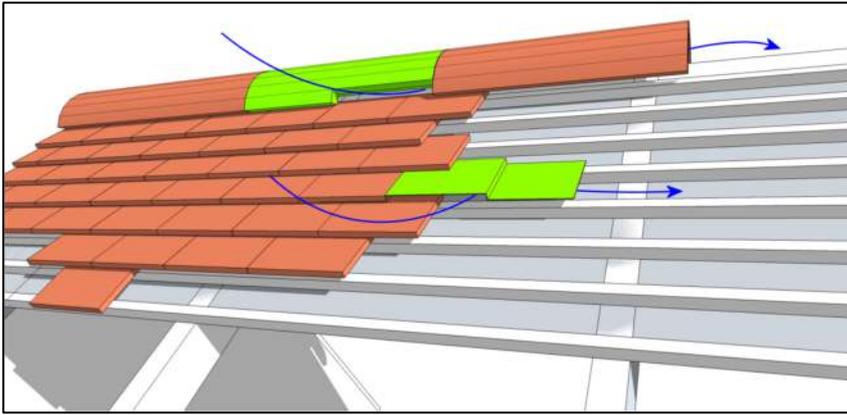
Access to the tile/lining cavity via a modified ridge tile and a lead saddle
